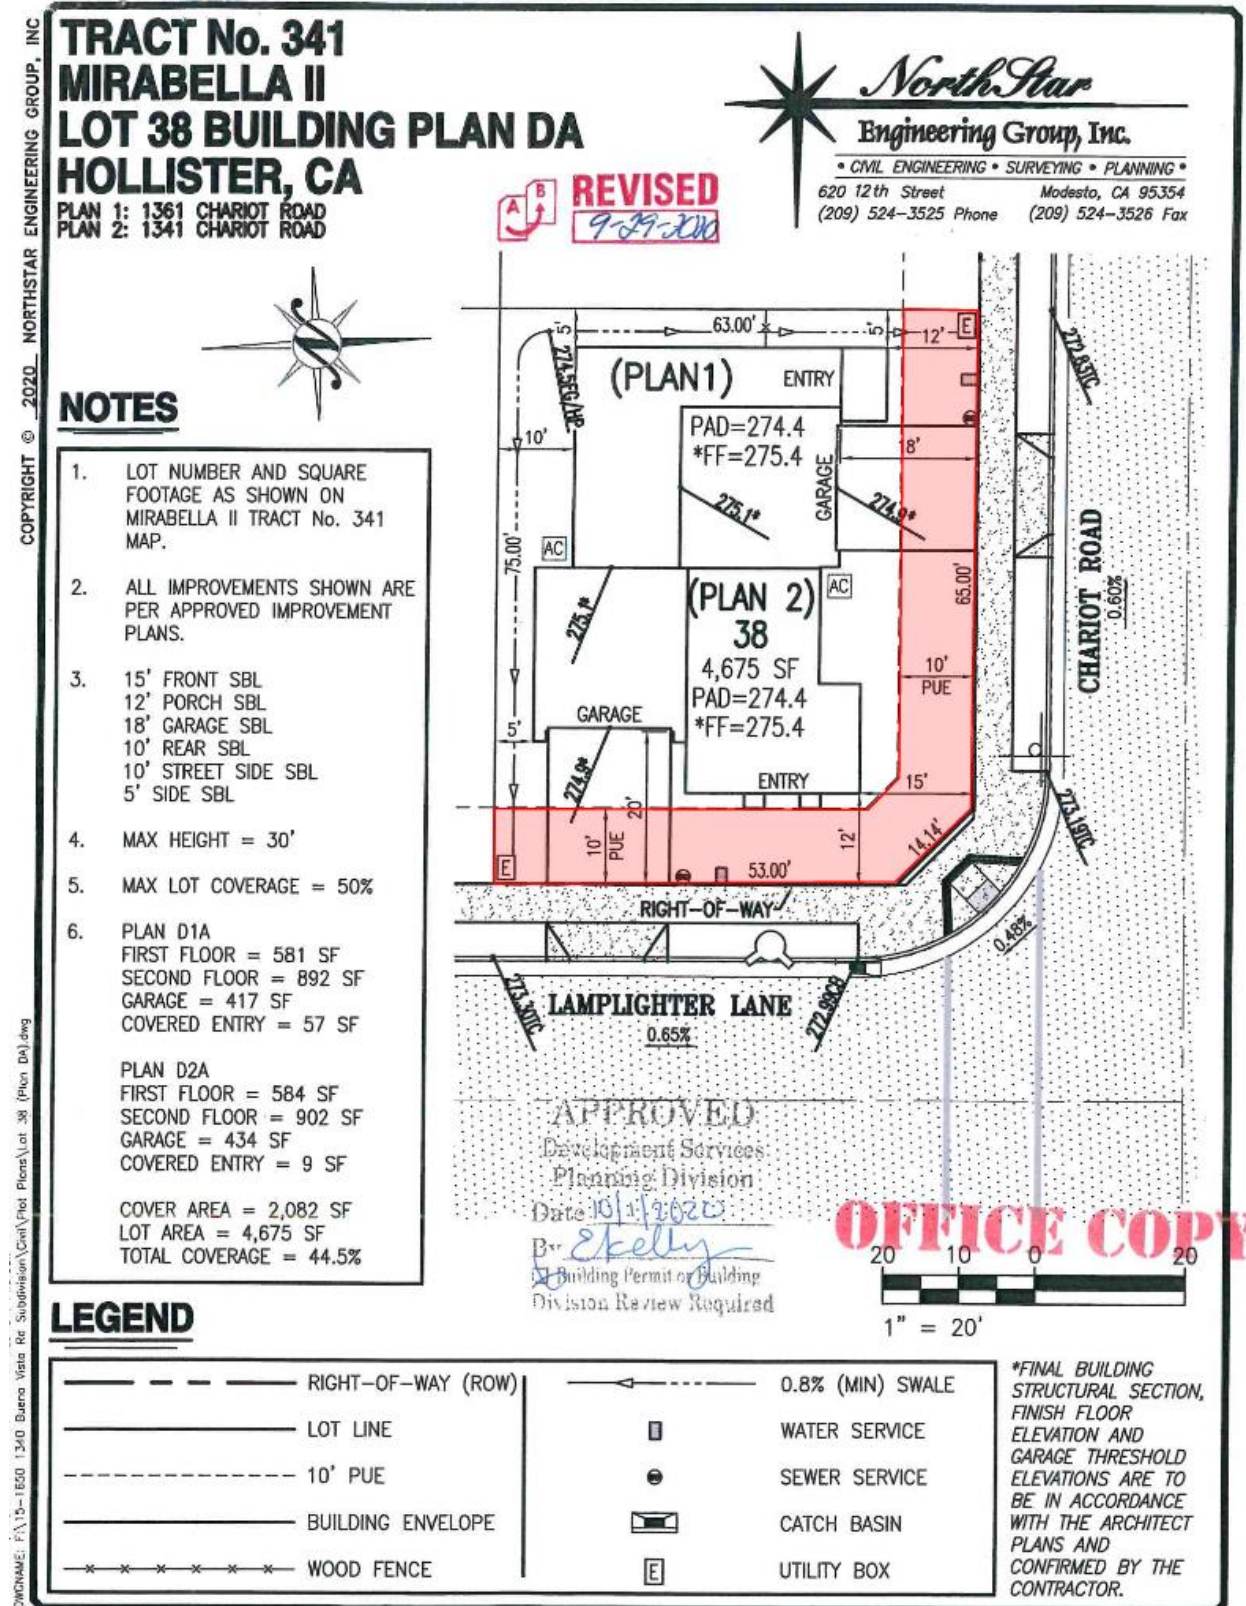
X: Plot Plan for 1341/1361 Chariot Road
